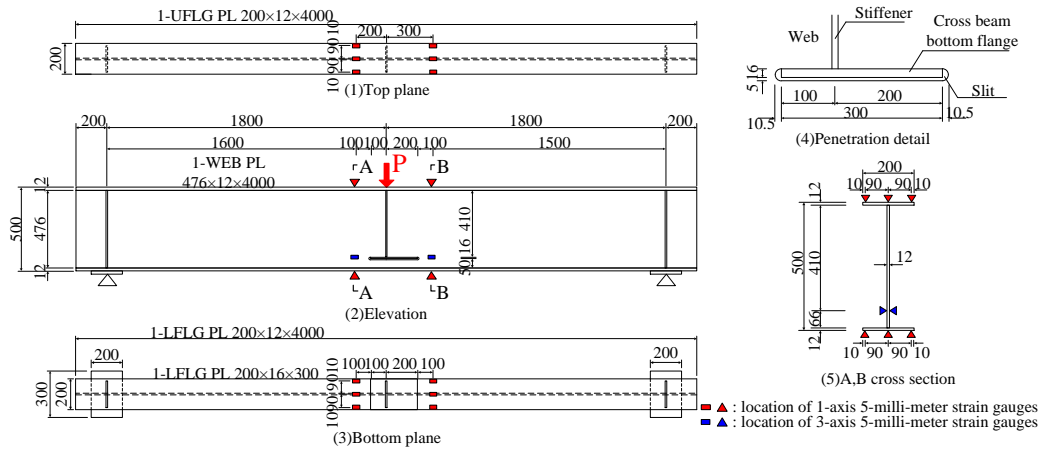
Configurations and dimensions of specimen and location of strain gauges.
